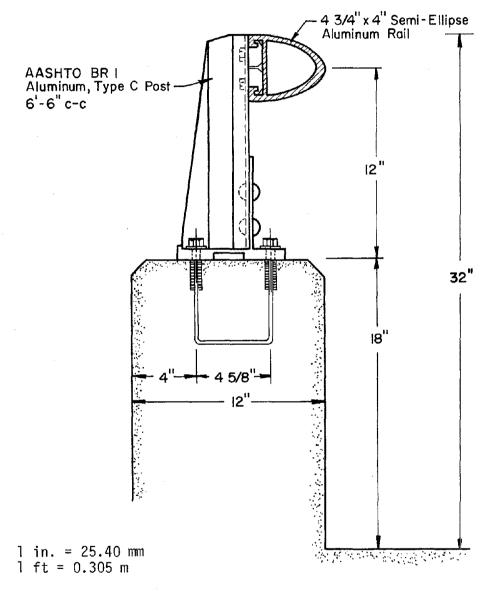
Cross Section of New Hampshire Two-Bar Aluminum Railing.
